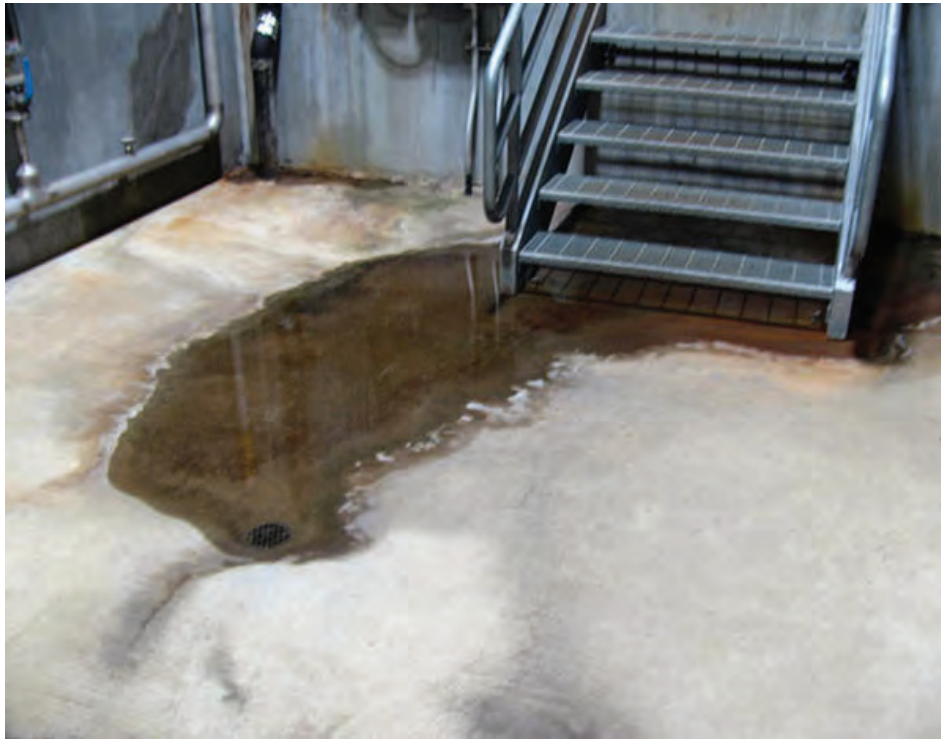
LS9 – Ponding water on the floor of the Ozone Gallery that is fed by an active leaking expansion joint.
